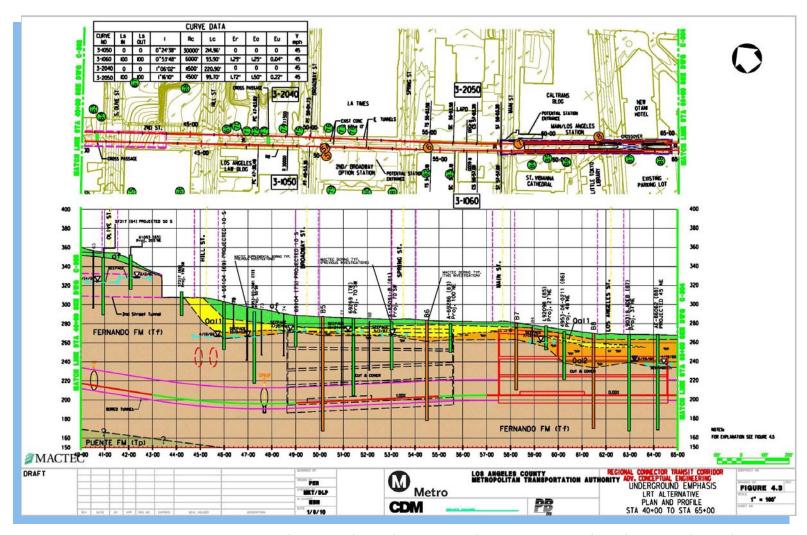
Underground Emphasis LRT Alternative Typical Underground Conditions
